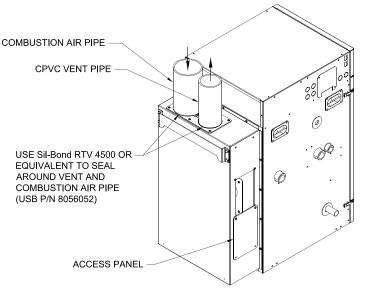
B: Field Installation of CPVC Vent Pipe -Wall Mounted Boiler Builds
